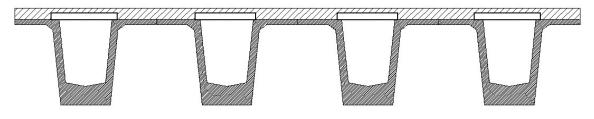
J(3) - TYPICAL CROSS SECTION OF PRESTRESSED CONCRETE TEEROFFS
